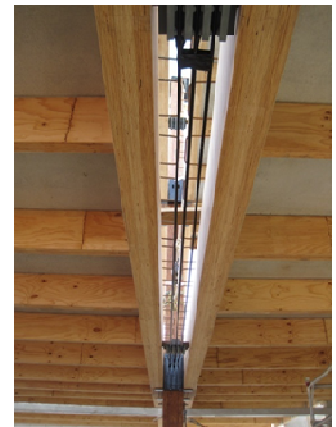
College of Creating Arts (CoCa) Building, Massey University, Wellington, New Zealand (Structural Engineers: Dunning Thornton Consultants)
